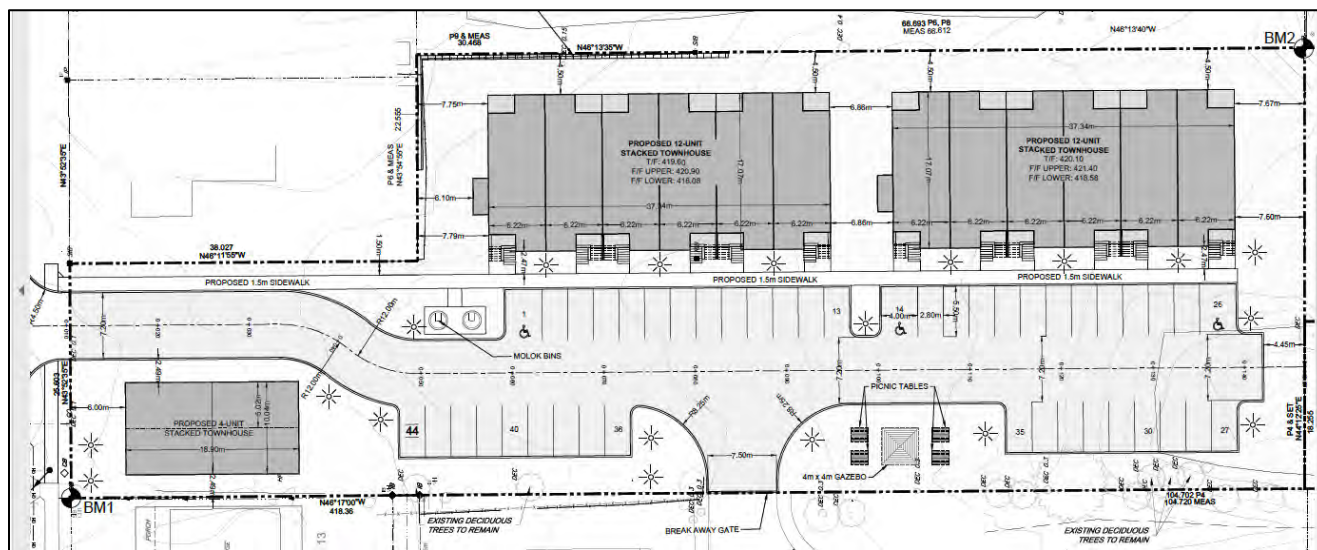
Site plan submitted by Cobide Engineering, December 2022
